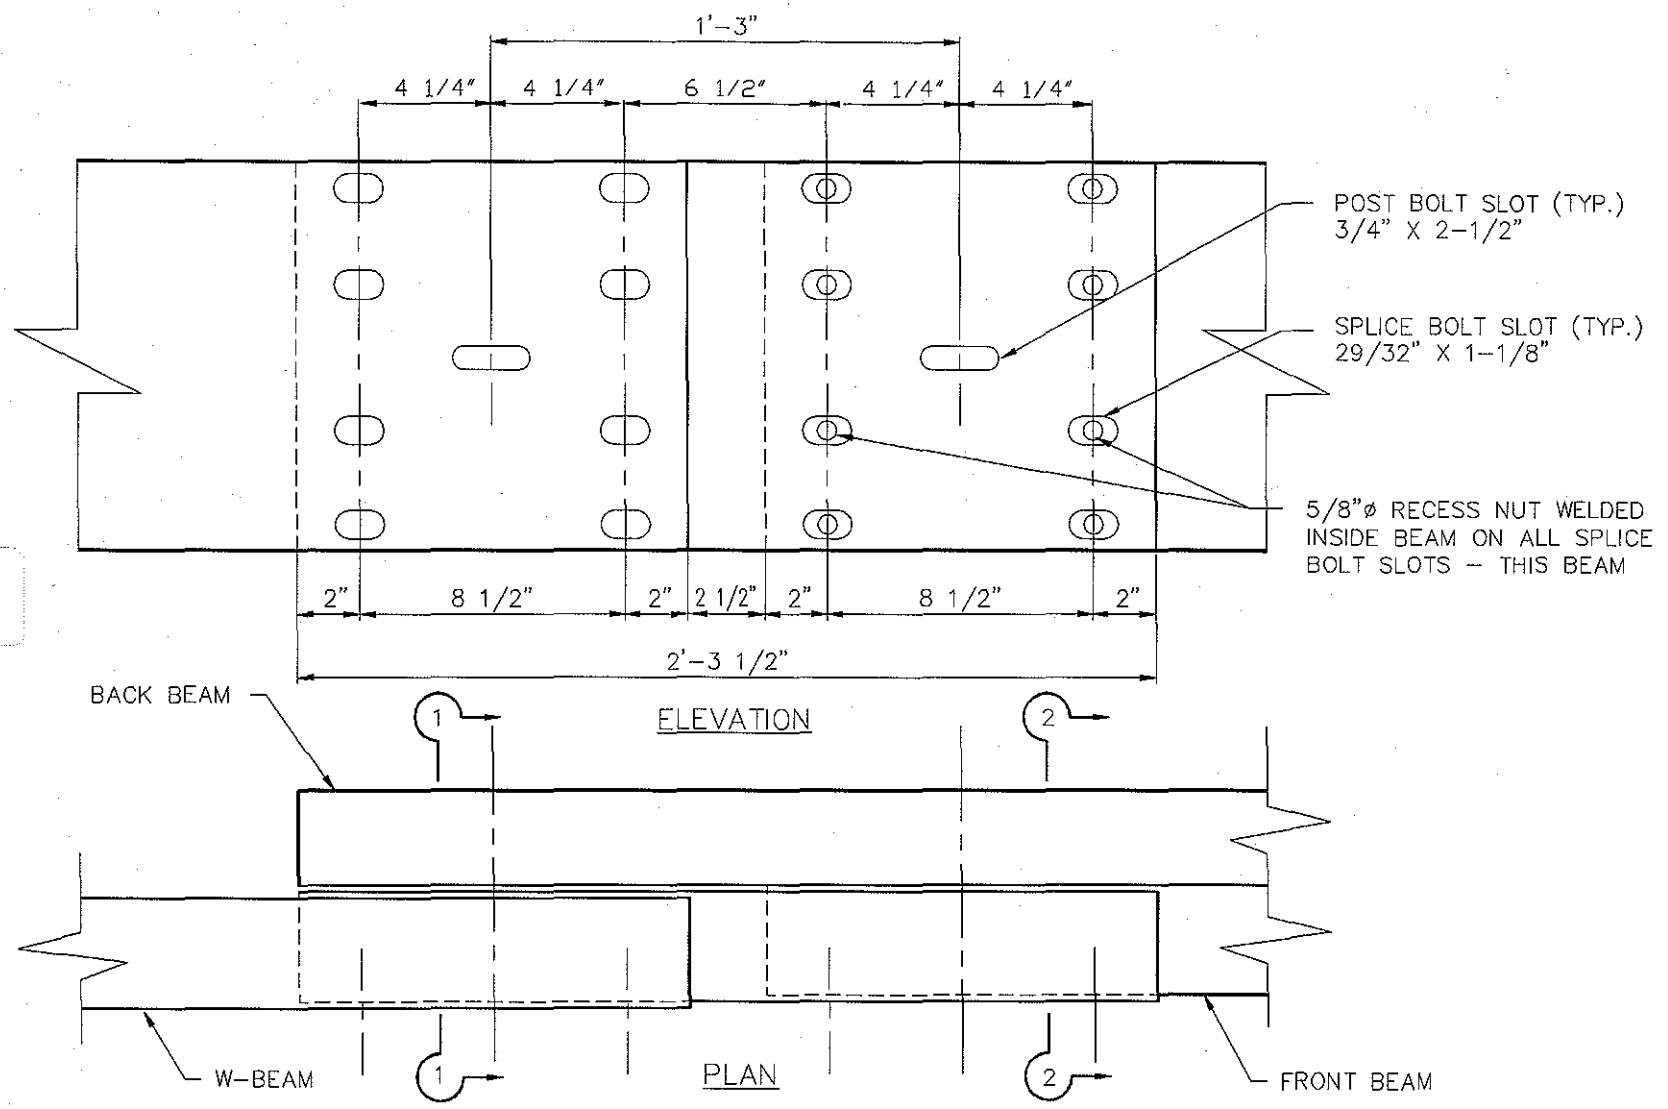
TERMINATION LAP SPLICE DETAILS USED IN TESTED INSTALLATION
